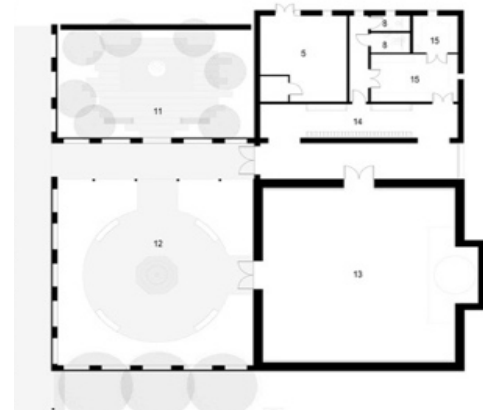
Ground floor Plan Remodeled Part (URL 6)
